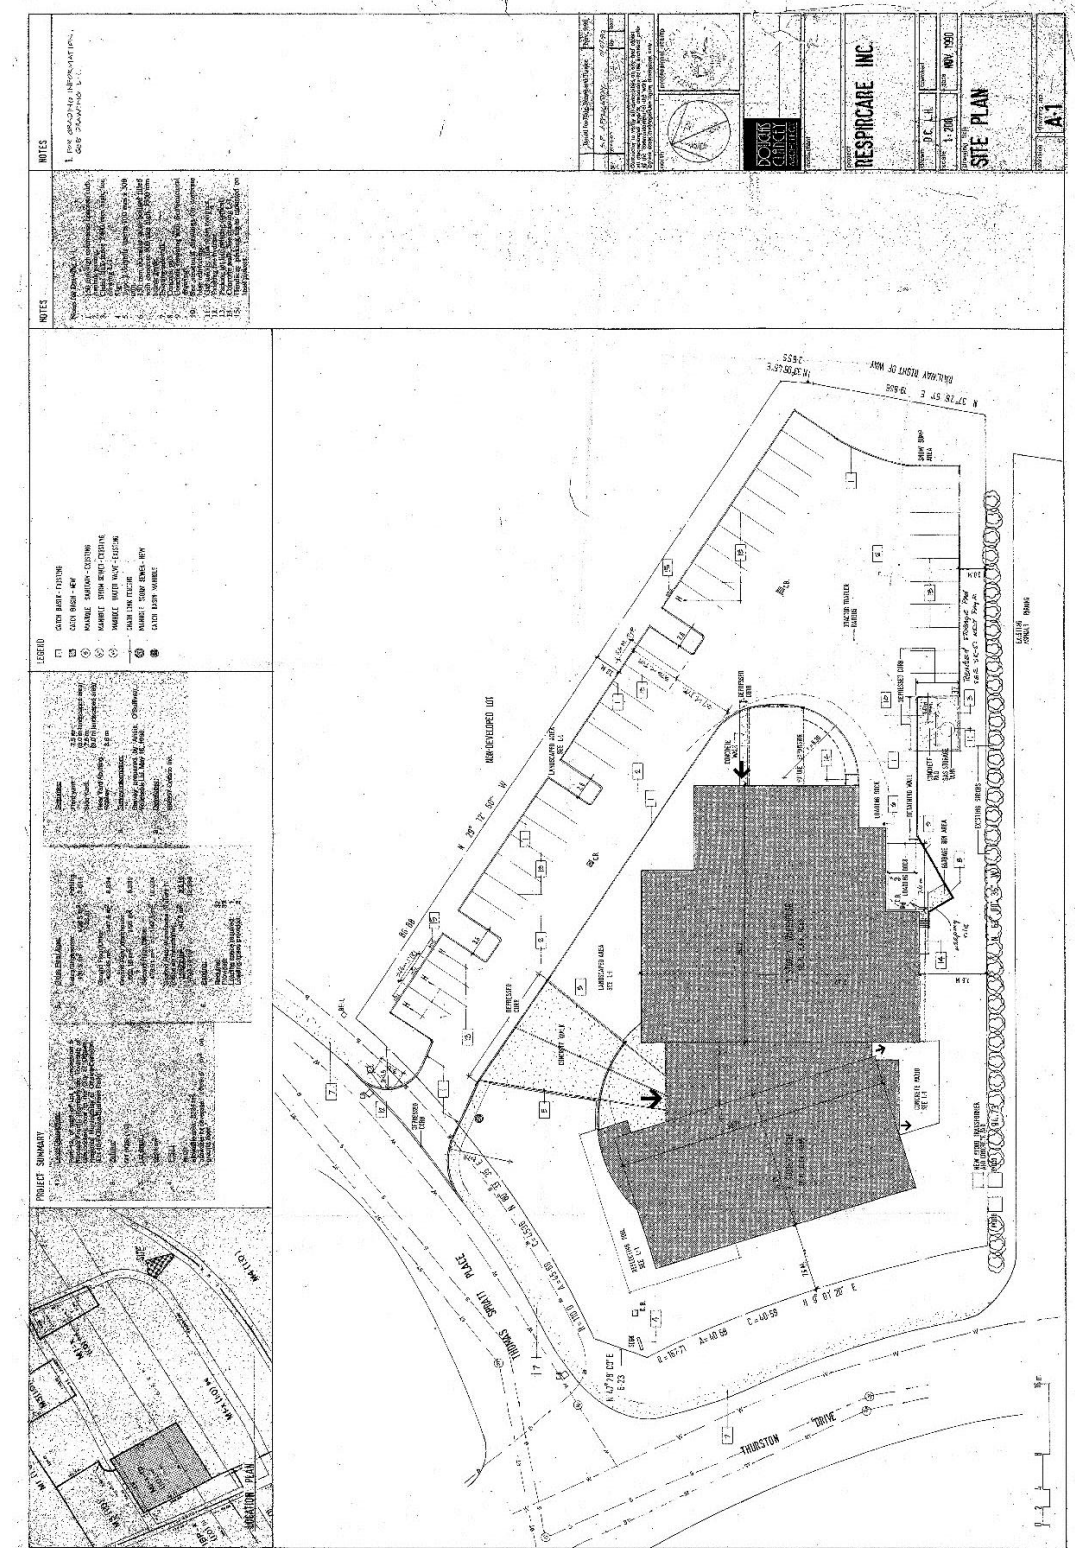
Existing Site Plan of Subject Site completed by Douglas Clancey Architects in 1990.
